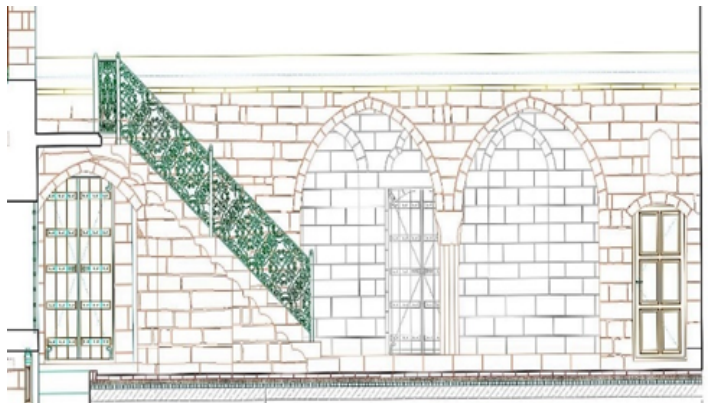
Analytical survey of the western façade of the building facing the courtyard
